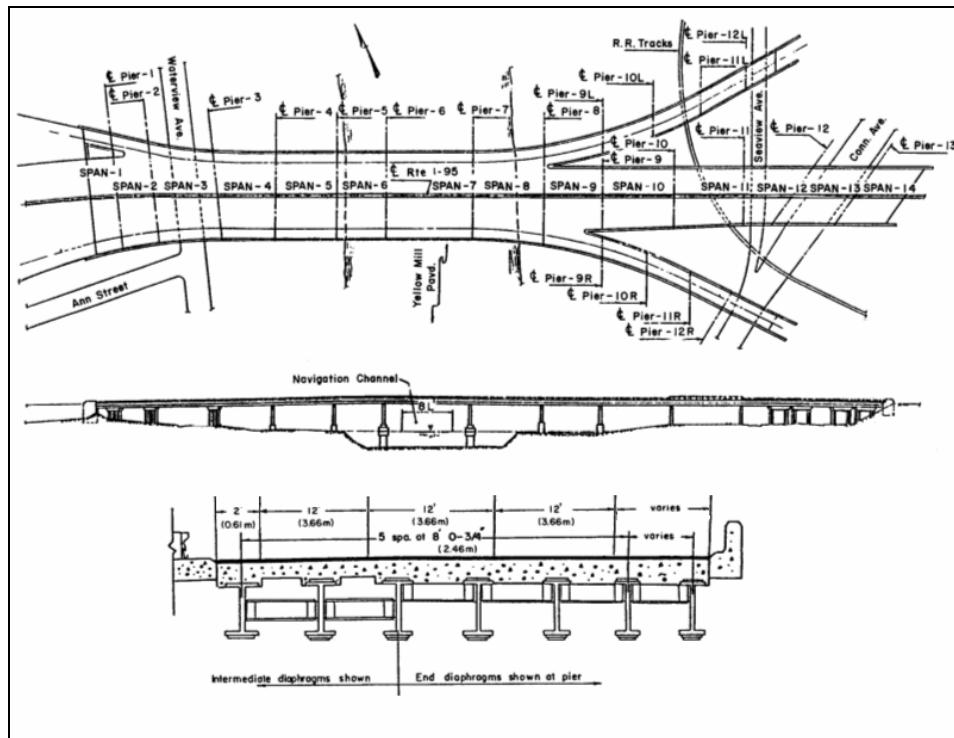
Plan, Elevation, and Typical Cross Section of the Yellow Mill Pond Bridge (Fisher, 1984).
